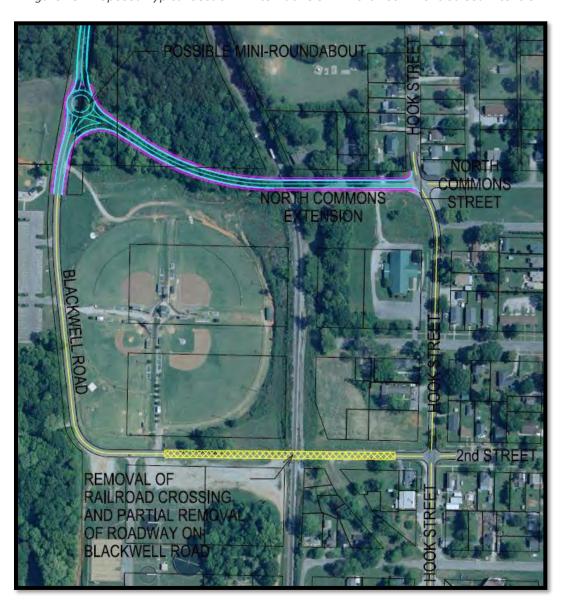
Alternative 5A - Map of North Commons Street Extension to Blackwell Road
